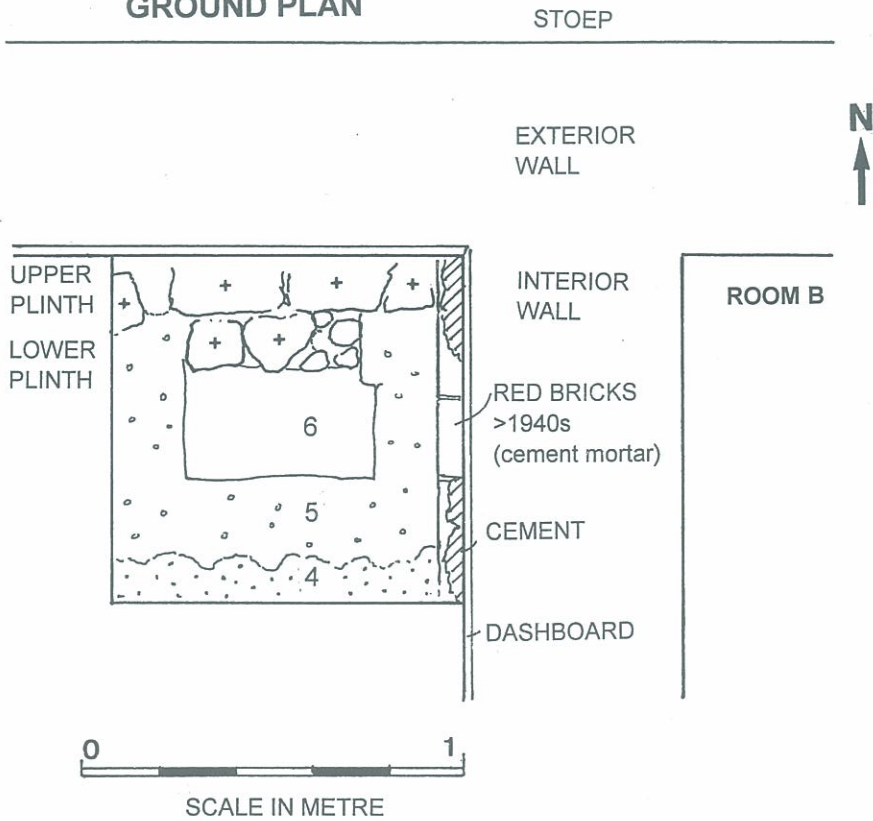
Ground plan of corner excavation C1/2 in Room C. The upper plinth would have carried the joists for a boarded floor.
